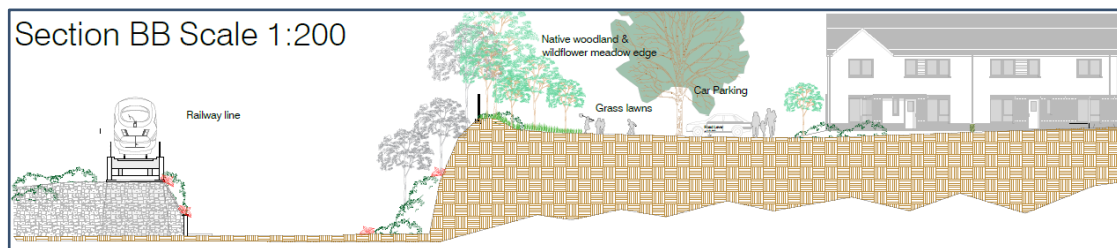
Extract from the 'Land Planning and Design' drawing (Cunnane Stratton Reynolds), showing the plan to keep existing topography.
